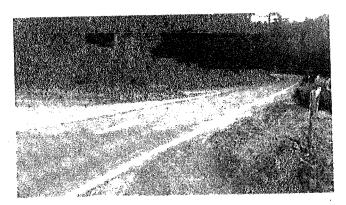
Photograph showing the intersection of Road 1 (Titlow hill Road) and Road 2 (Old Highway 299). The Road 2 access point is at mile post markers is 0.55 miles on Titlow Hill Rd. Road 2 is paved, meets Category IV standards.
